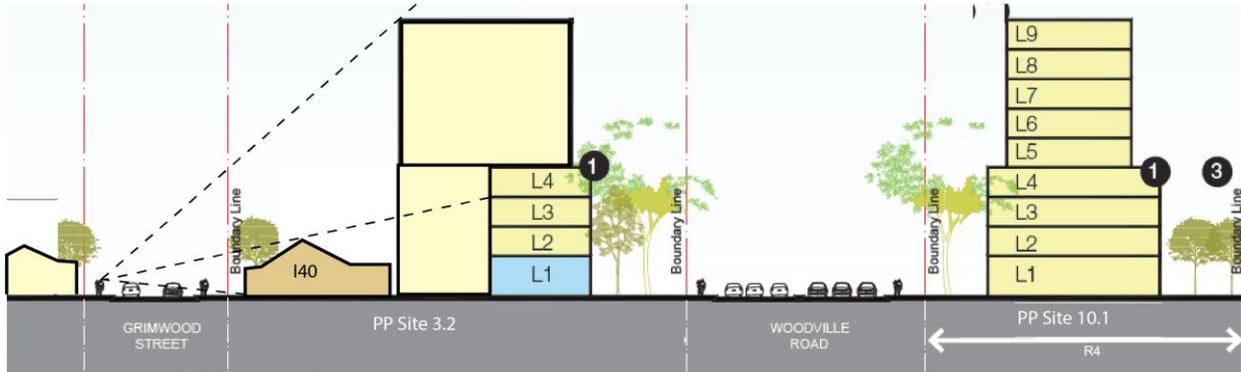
Indicative sightlines from Grimwood Street to 'Grimwood Street Group' (I40). Diagrams are not to scale. *Source:* CM+ 2023 with Extent Heritage overlay.
